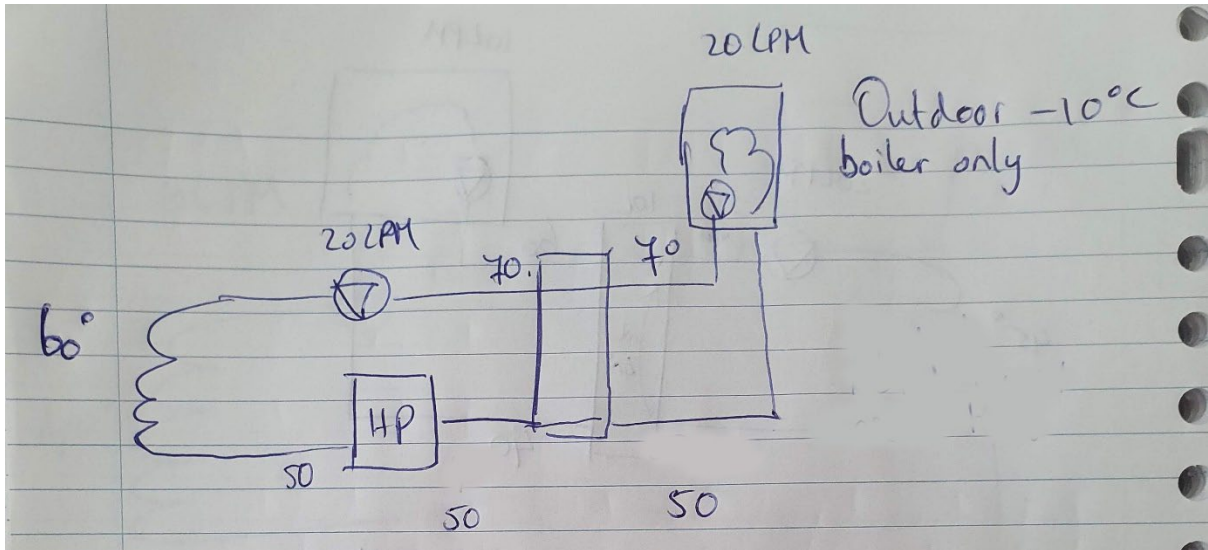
Gas boiler + hydraulic separator + heat pump in full gas boiler mode (Own figure)
